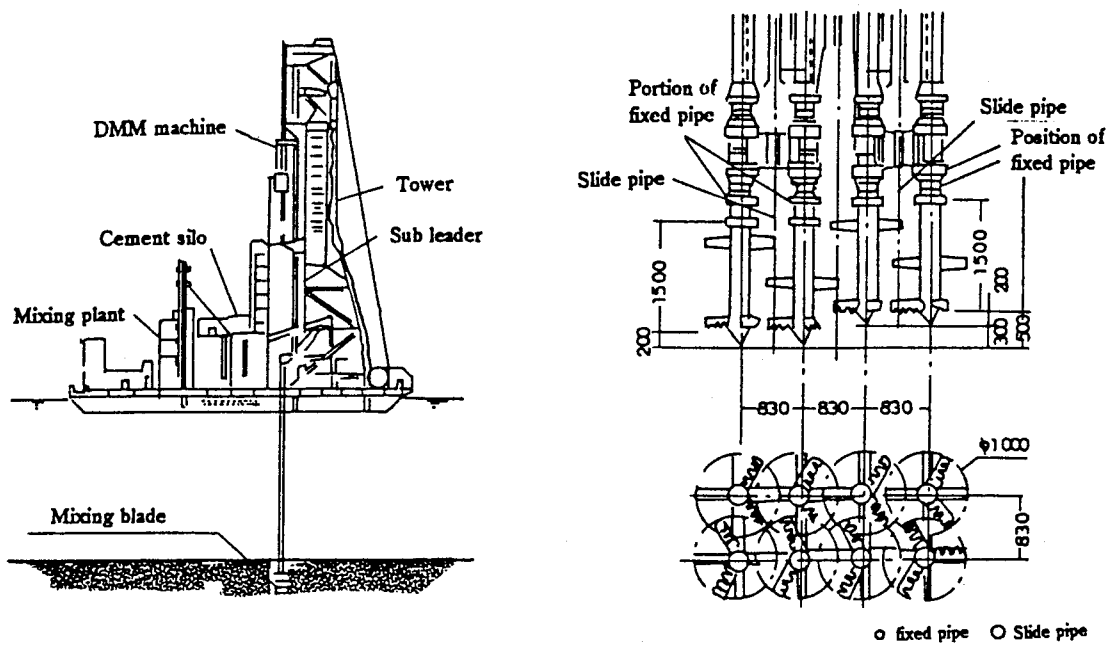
Detail of mixing blades (Unami and Shima, 1996).
